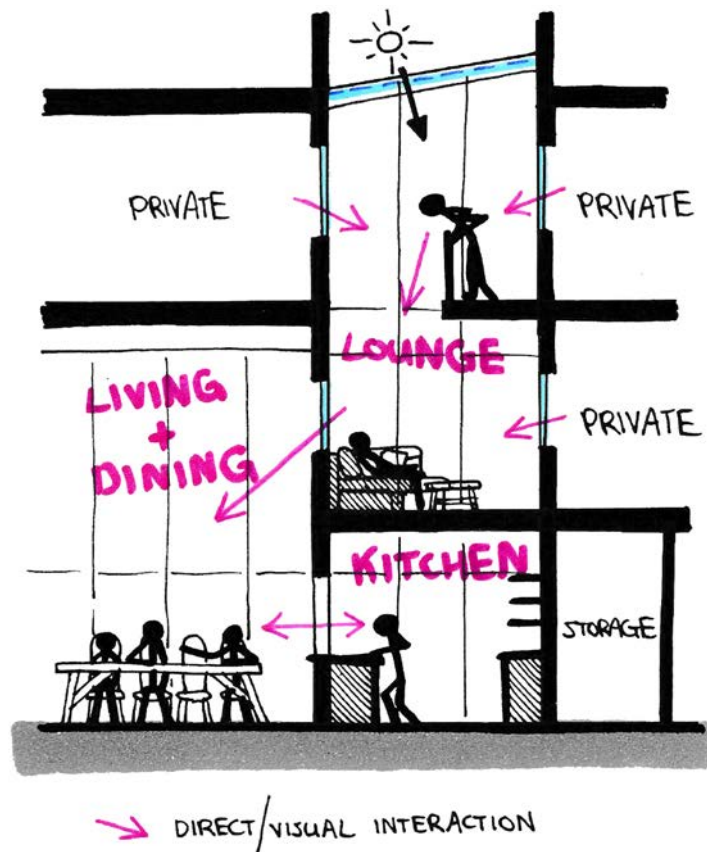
(see section in plan fig. 7.47) A sectional drawing of the common lounge and surrounding collective and private spaces showing a multitude of interaction possibilities (by author)
